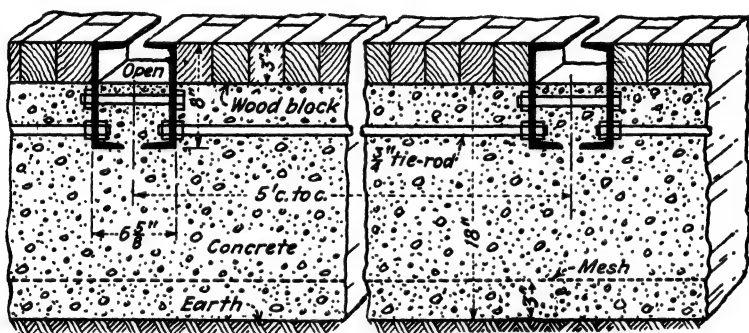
Foundation for an erecting floor for 100-ton machines.
